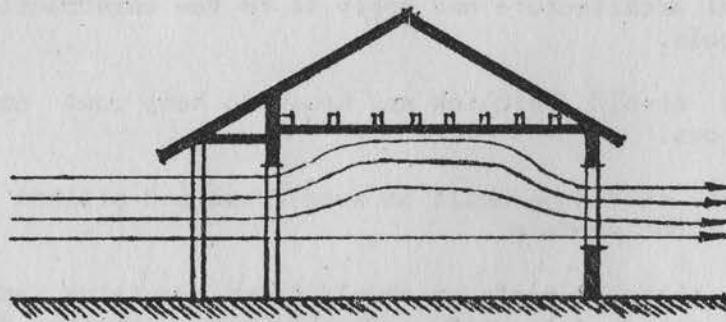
Classrooms with ceilings under them as hard surface restricting typhoons from blowing up roofs.
